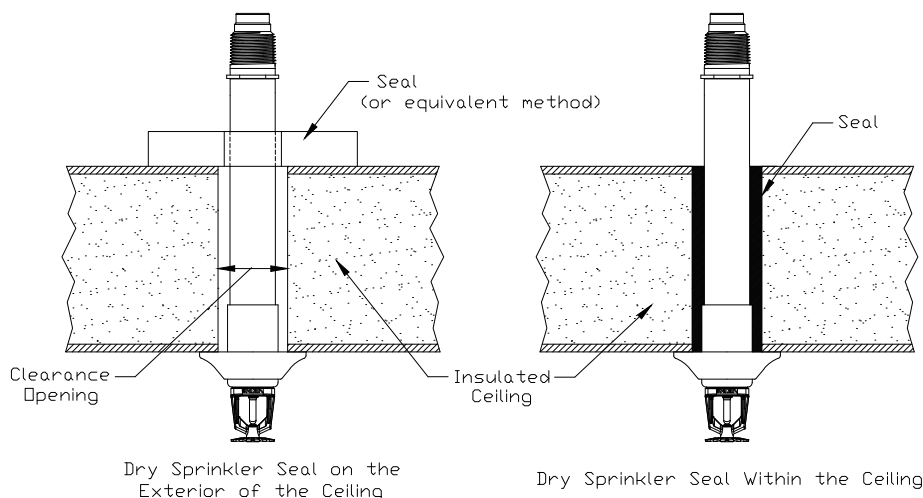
Dry Sprinkler Seal (Adjustable Standard Dry Pendent Sprinkler is Shown)
